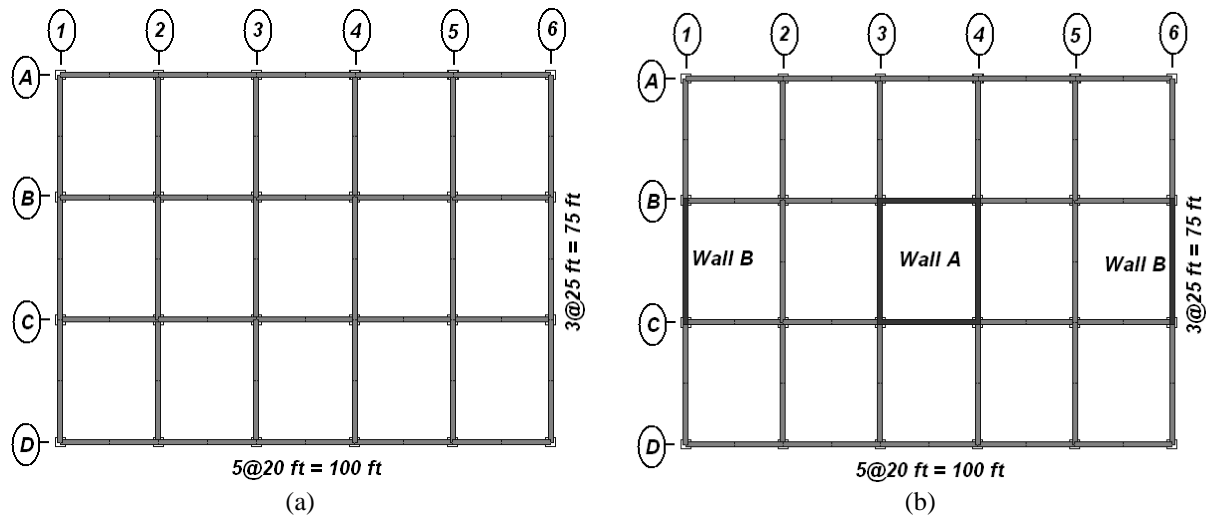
(a) Plan of the framed system tall building, (b) plan of the shear wall-frame system tall building.
